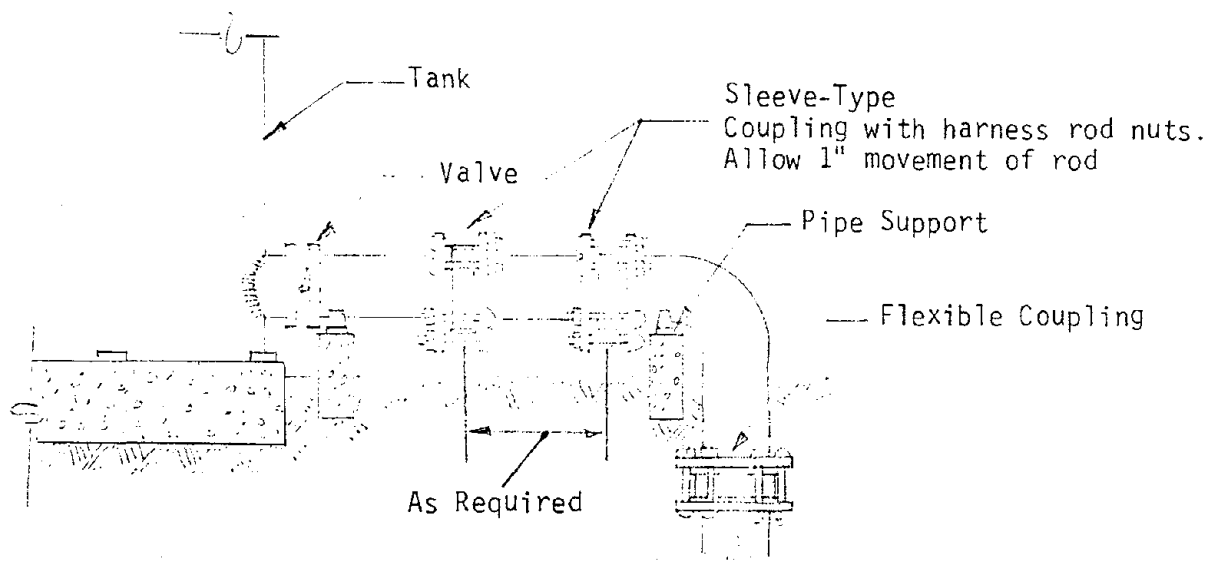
Schematic of a Flexible Restrained Joint for Pipe Connection to Storage Tank (65).
